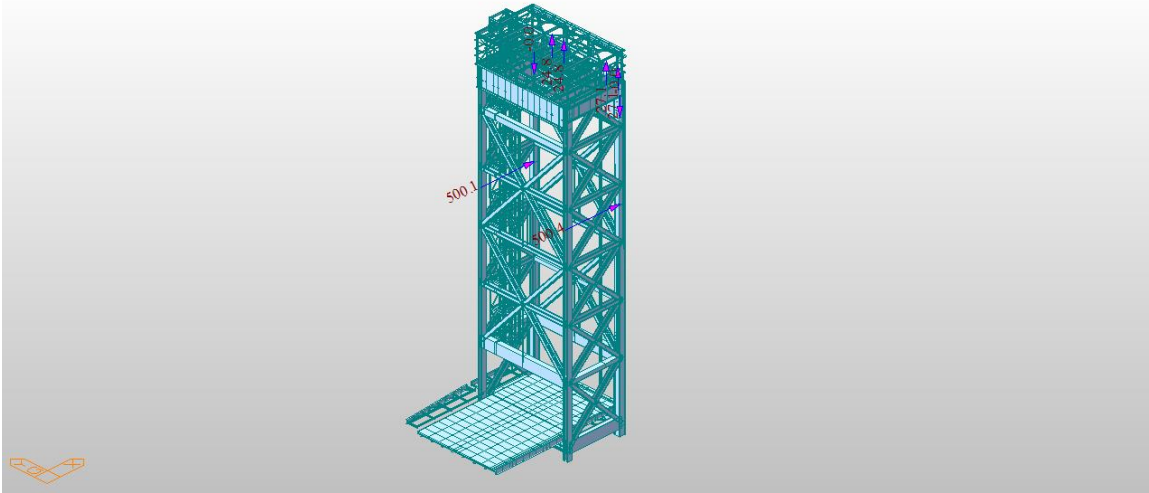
Wind Load Longitudinal 1 (South to North) – Bridge
